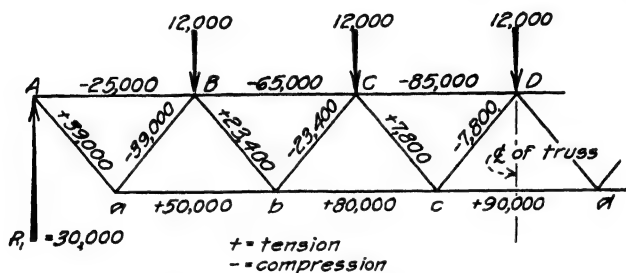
Dead load stresses, deck Warren truss. All dead load at top chord joints.
